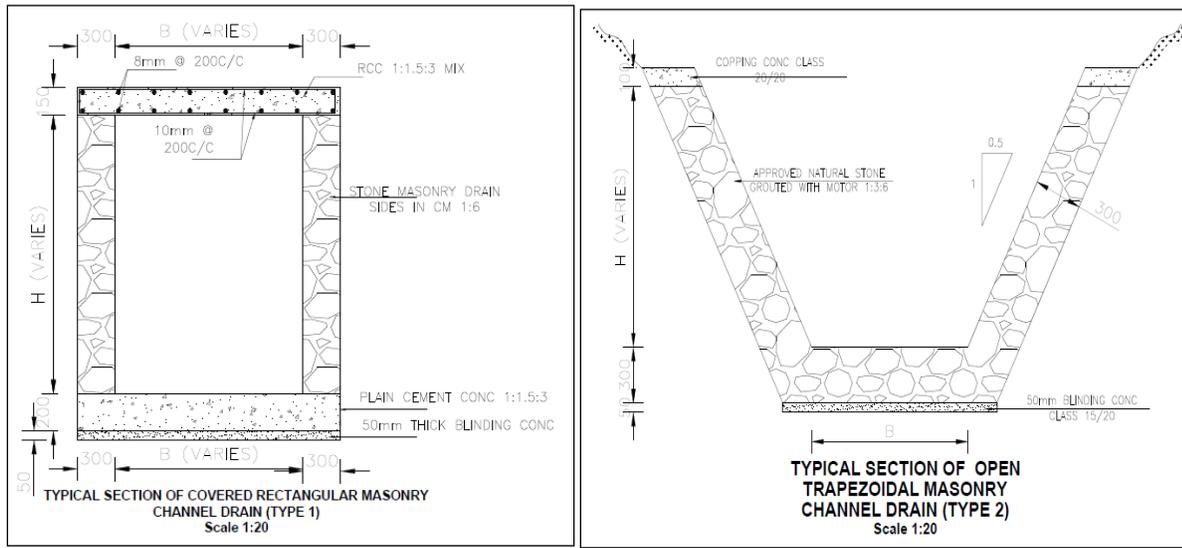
Typical cross section of drain with Rectangular or Trapezoidal masonry
